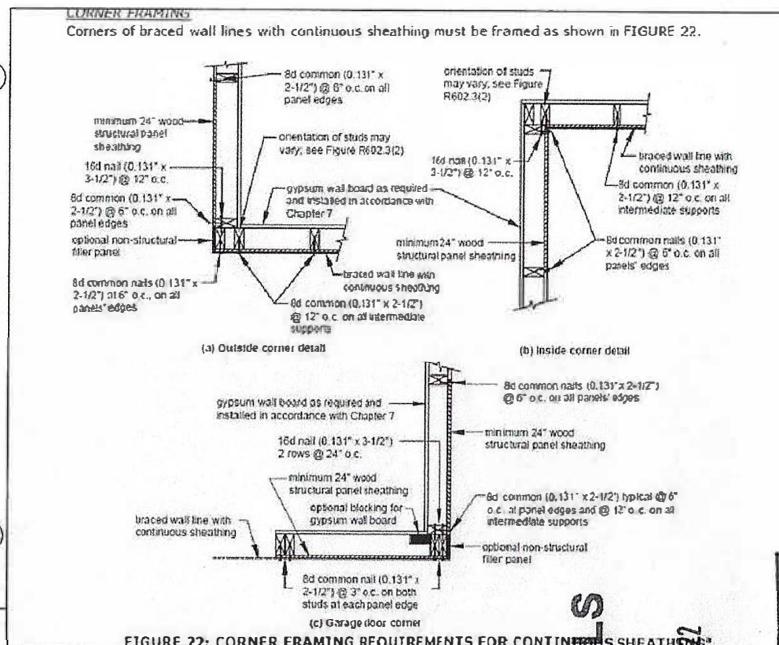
CORNER FRAMING REQUIREMENTS FOR CONTINUOUS SHEATHING
